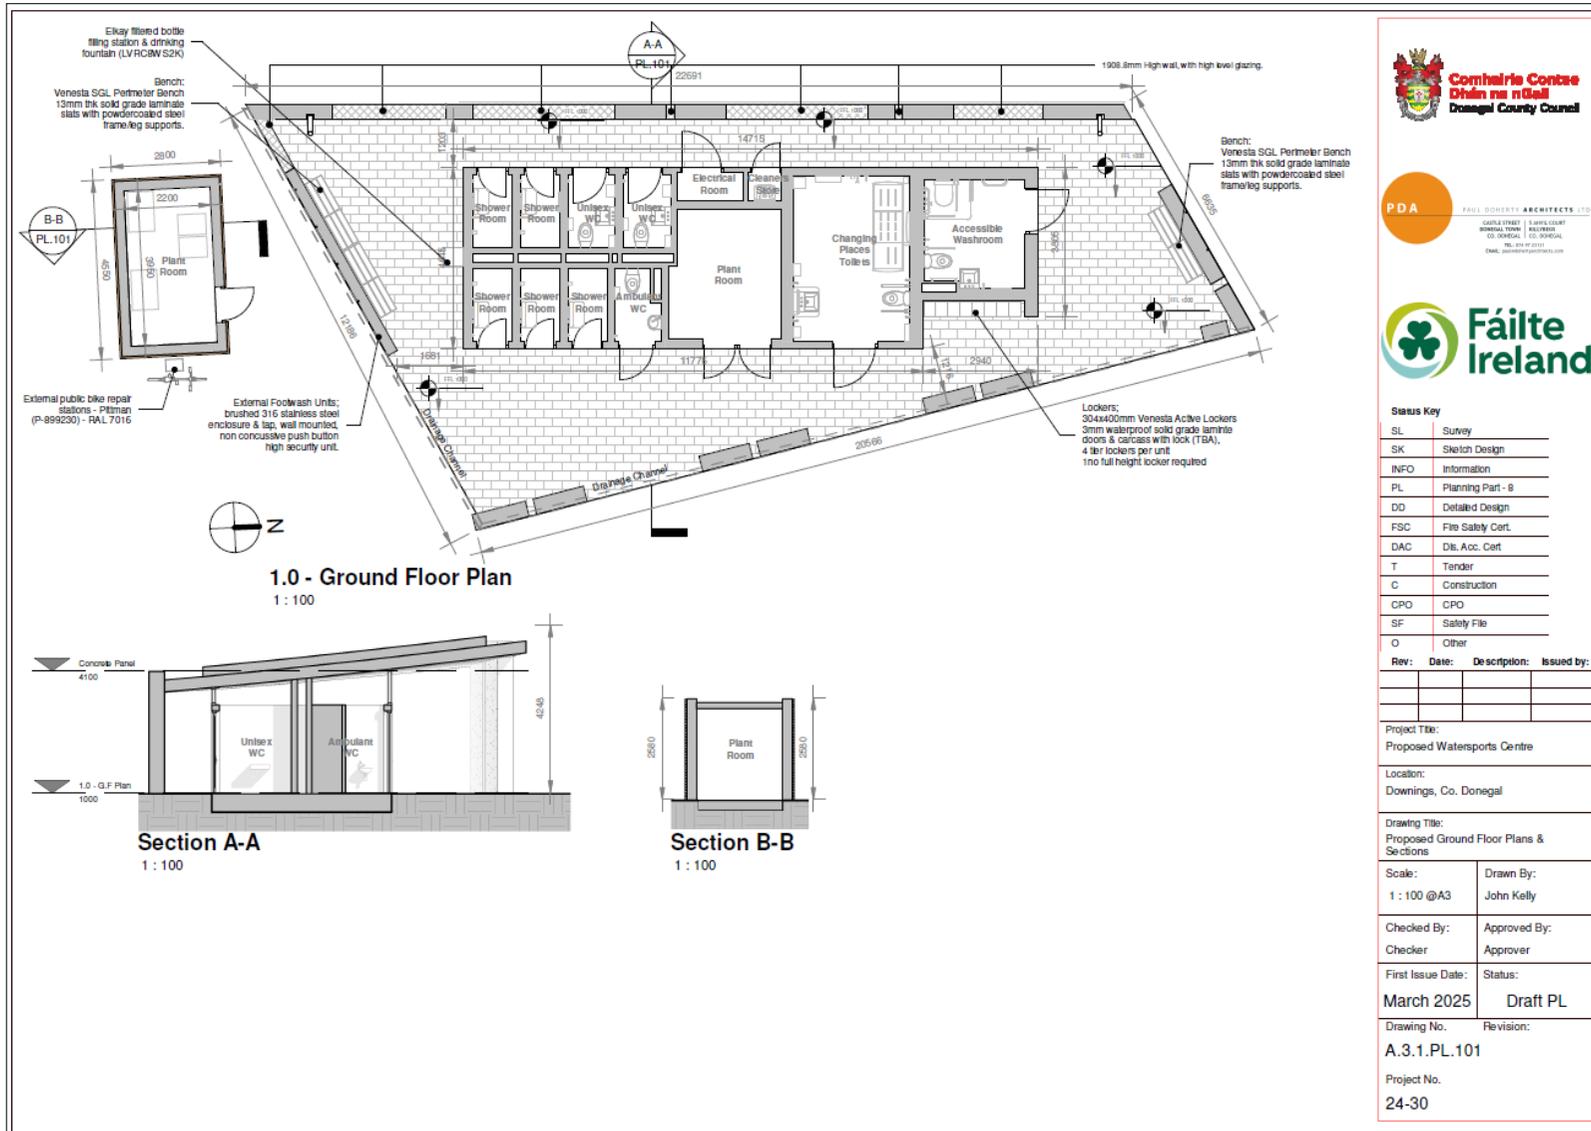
Proposed ground floor plans and sections as supplied by Paul Doherty Architects Ltd. (Not to scale).
